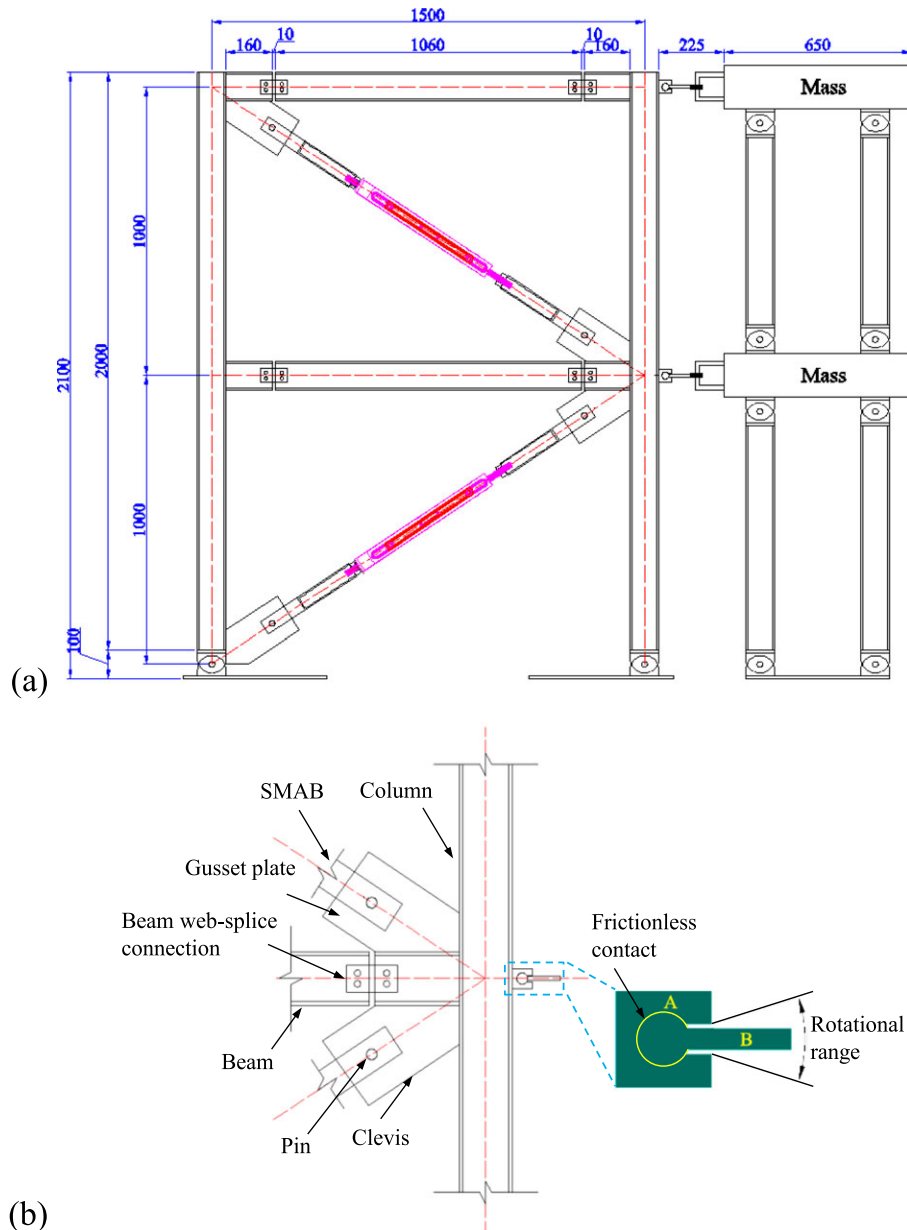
The schematic of the tested SMABF model: (a) elevation view (dimension unit: mm) and (b) close-up view of brace-frame and frame-mass connections.
